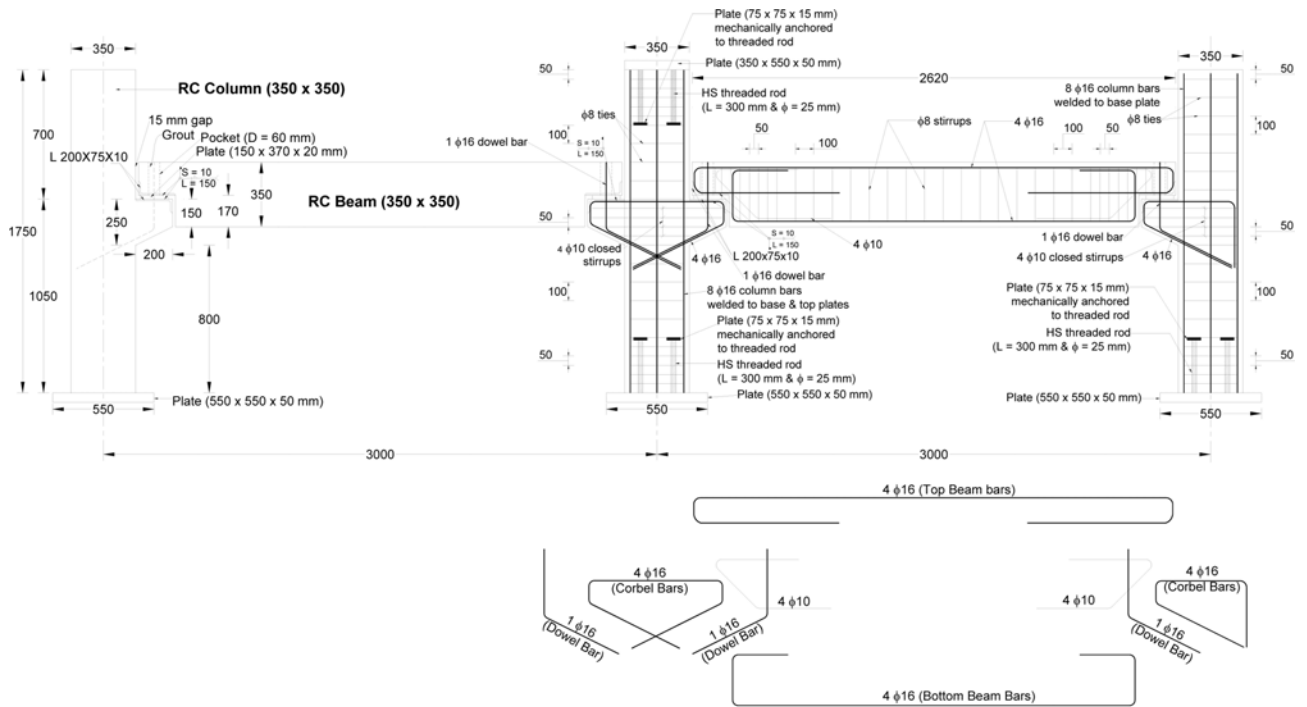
Details of Precast Specimen PC-A (Note: All dimensions are in mm)
